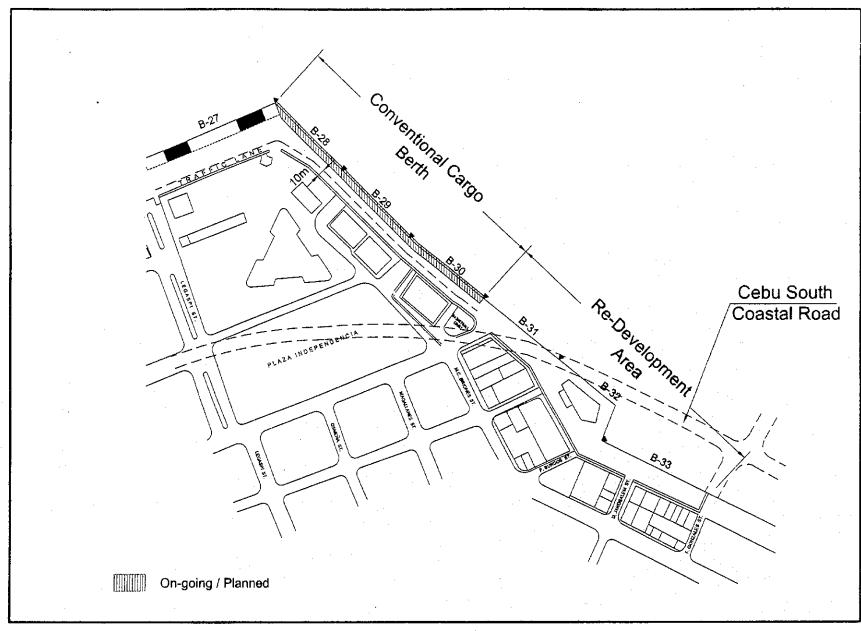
Short-term Development Plan (PMO 5)
